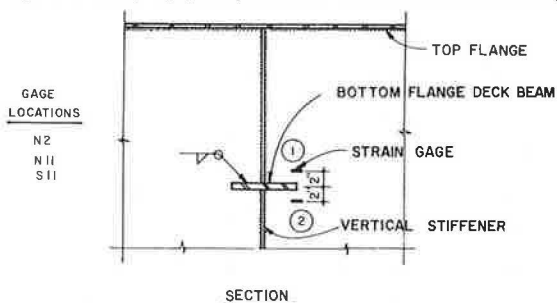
Group J gages at junction of deck beam and web of tie girder.
